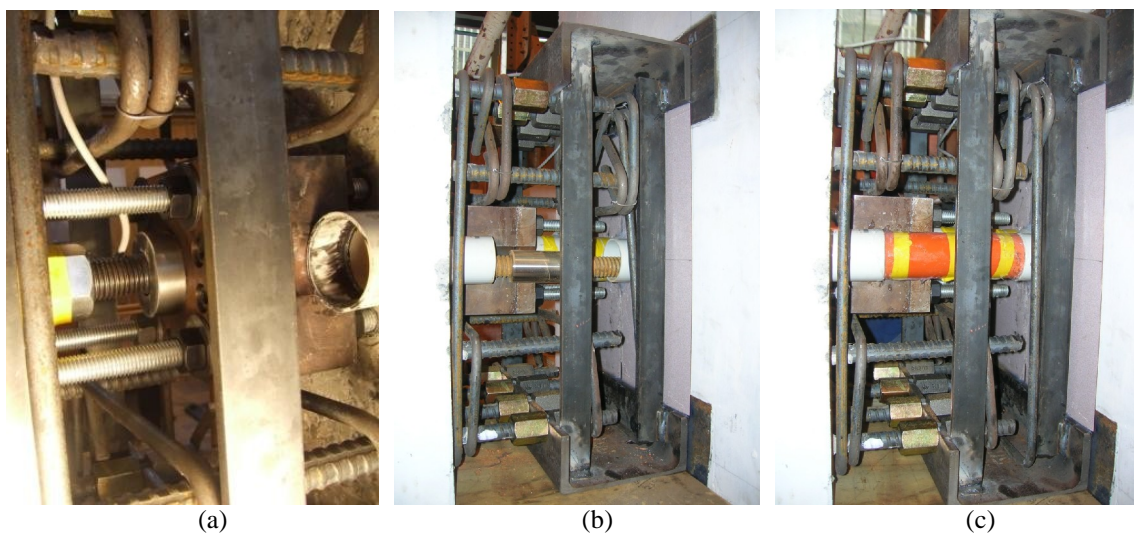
Photographs of the cast insitu joint showing (a) the east beam with the thread-bar exposed; (b) east beam with the thread-bar enclosed in PVC; (c) the west beam showing the damper and coupler.
